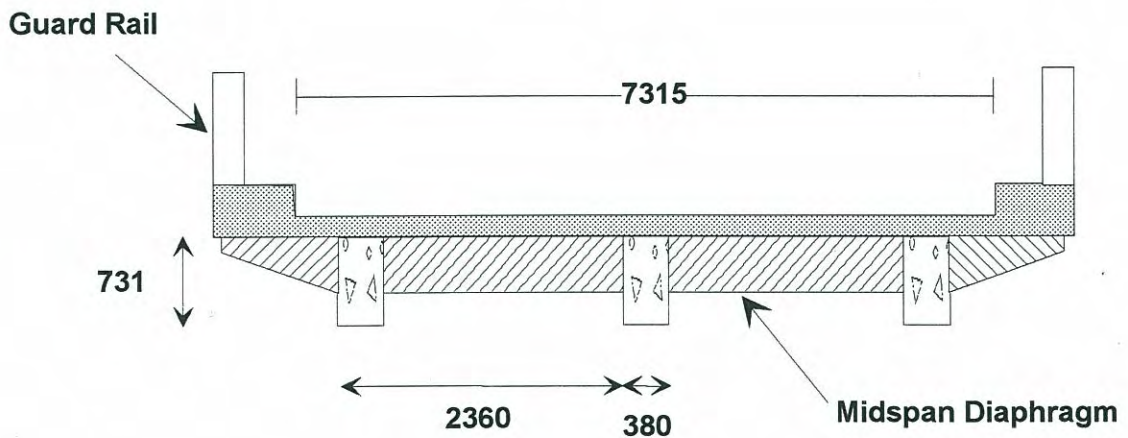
Cross section of Waitangi Bridge superstructure (dimensions in mm).
